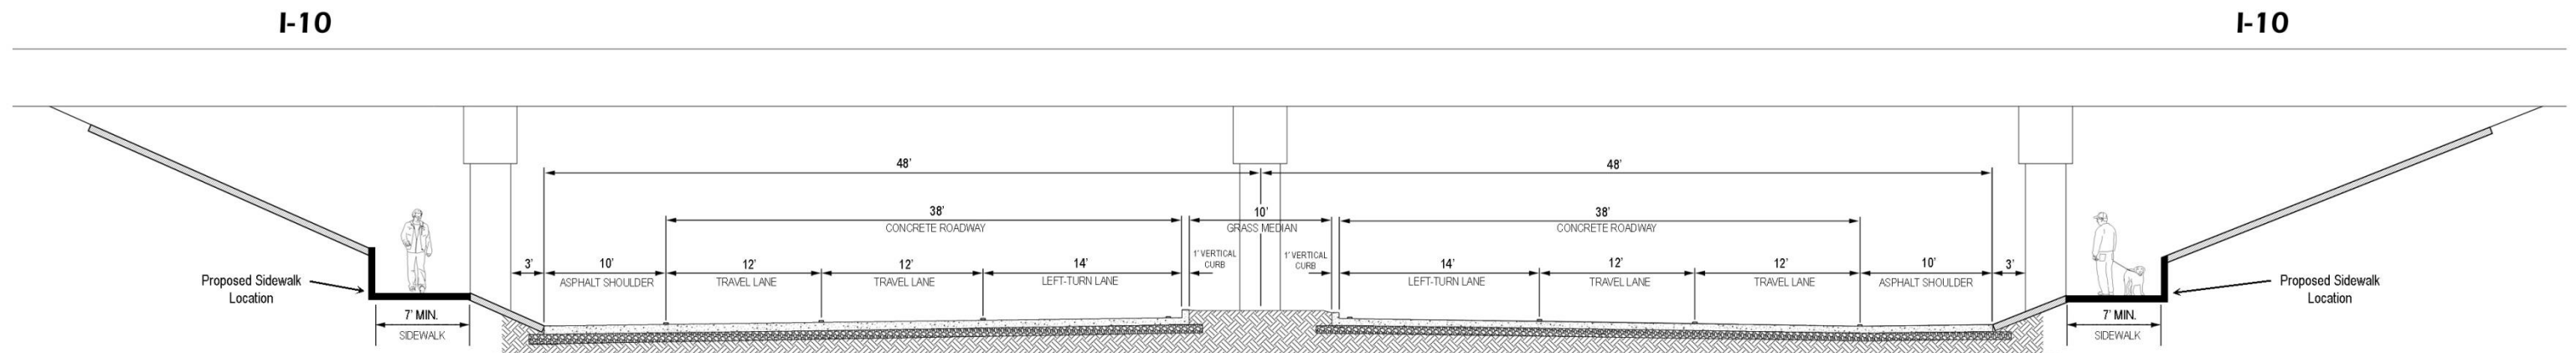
RECOMMENDED SECTION – US 190 (GAUSE BOULEVARD) @ I-10 OVERPASS
